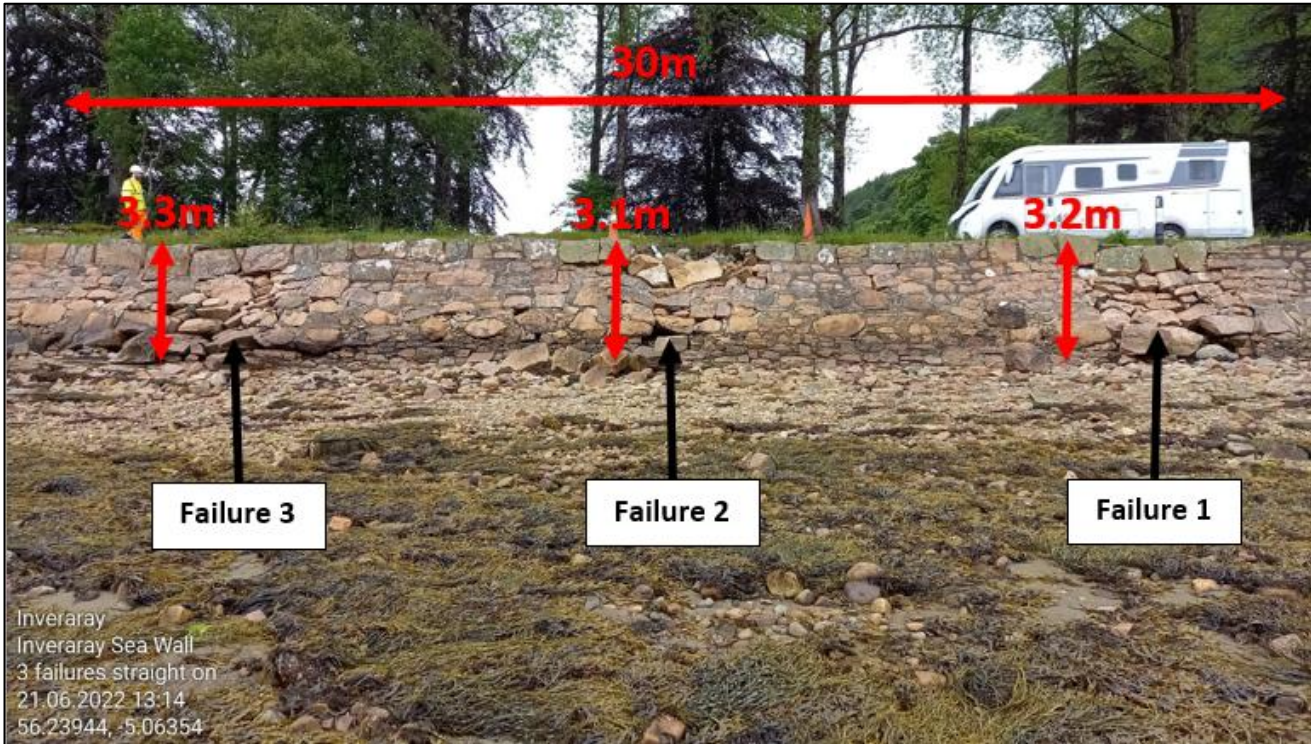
Sea wall failures over 30m stretch at site.
